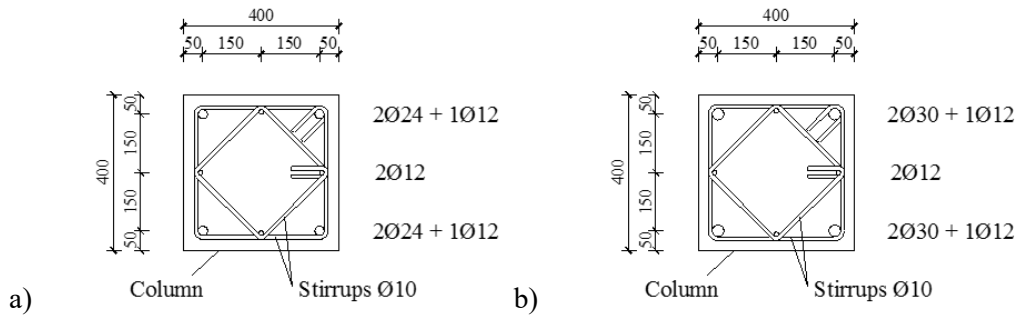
Column reinforcement a) P24 and b) P30 specimens.
